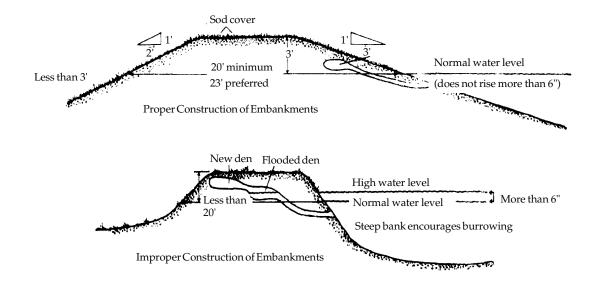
Proper dam construction can reduce muskrat damage to the structure.
